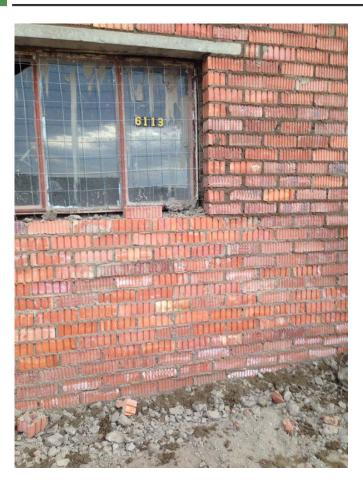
& 002: Indicating damages to brickwork, roofing and gumpoles.
